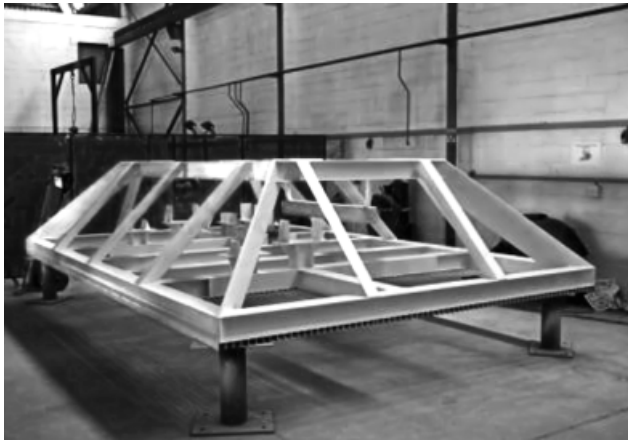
Typical subsea frame (3 m × 4 m plan area) with grillage foundation. Image courtesy of Subsea 7, UK
